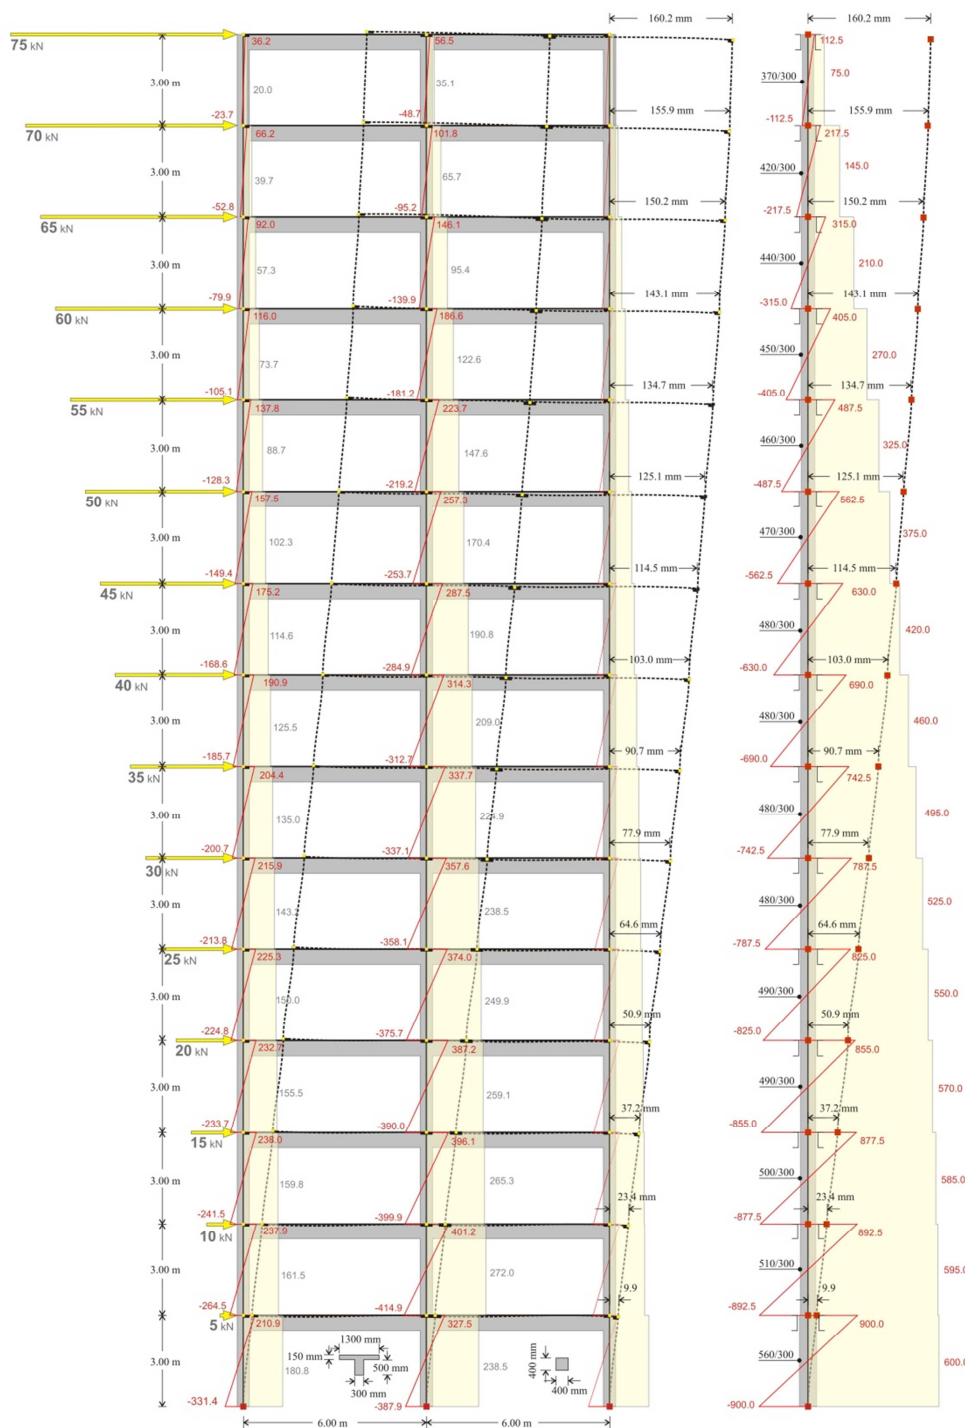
FRAME type structure comprising three columns with cross-section 400/400
